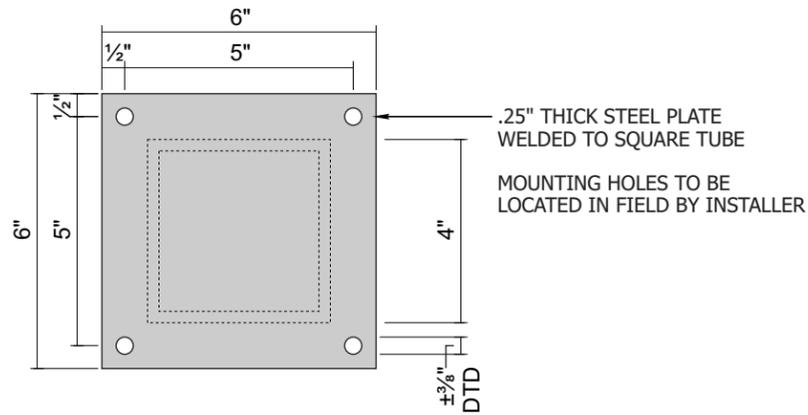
PLATE MOUNT SECTION - TO 'IMAX' LETTERS SCALE: 3" = 1'-0"
